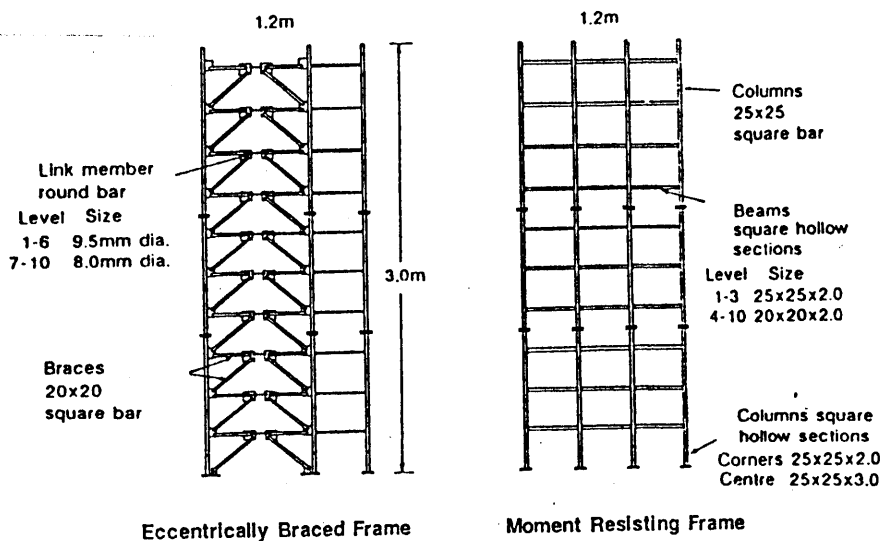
10-Storey Model details: Eccentrically-Braced Frames and Moment Resisting Frames
